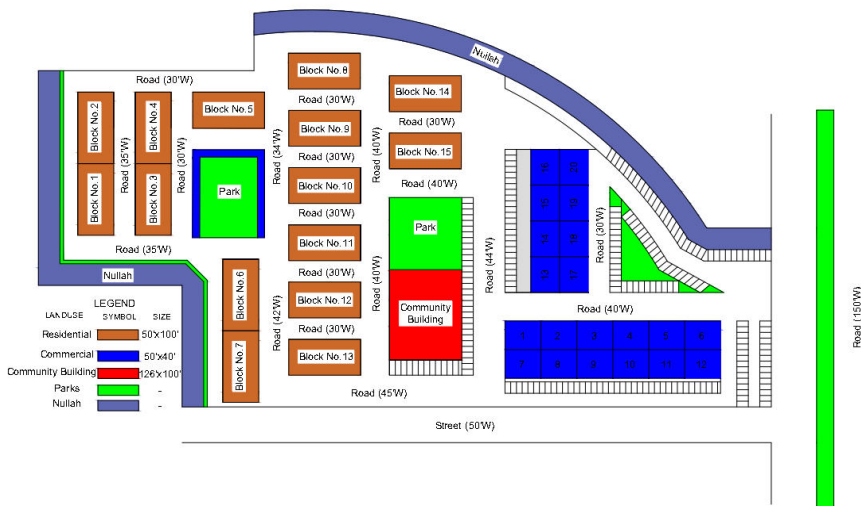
Proposed Re-development Plan of France Colony, Sector F-7/4, Islamabad
